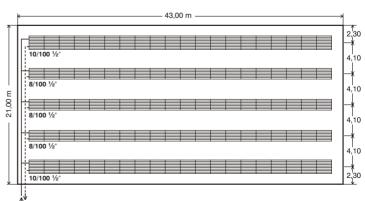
Example of ECOPAN panels in warehouse with average height of 5.5 m and parallel panels on greater side
